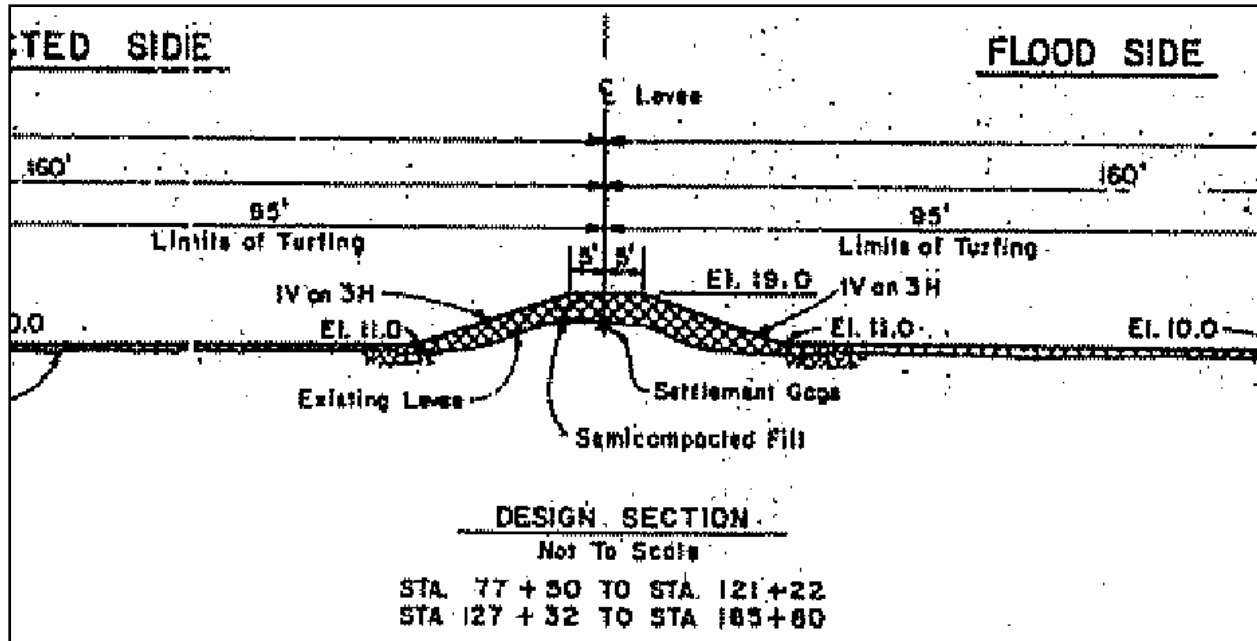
Design Section for South Bank GIWW Levee Enlargement in 1985. Levee was built to approximate elevation +14 ft. circa 1970. Additional lift up to elevation 19 was added circa 1985. Post-Katrina LIDAR along the south bank GIWW shows the unscoured levee crown was up to approximate elevation 16 ft. Storm surge along the GIWW was approximately 15 to 17 ft, causing an overtopping crest of 1 to 2 ft
